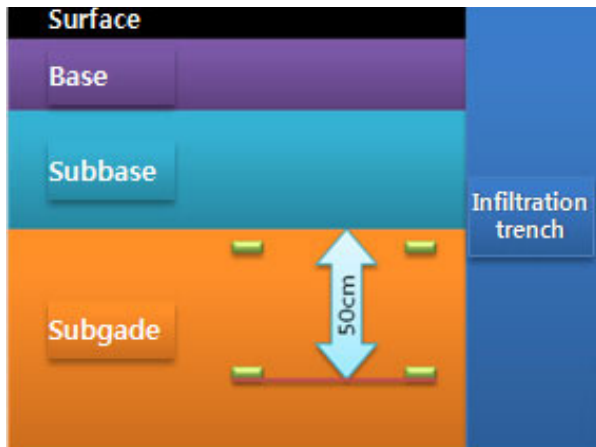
Water Content Sensor Spot (Test Road) : Cross-Section
